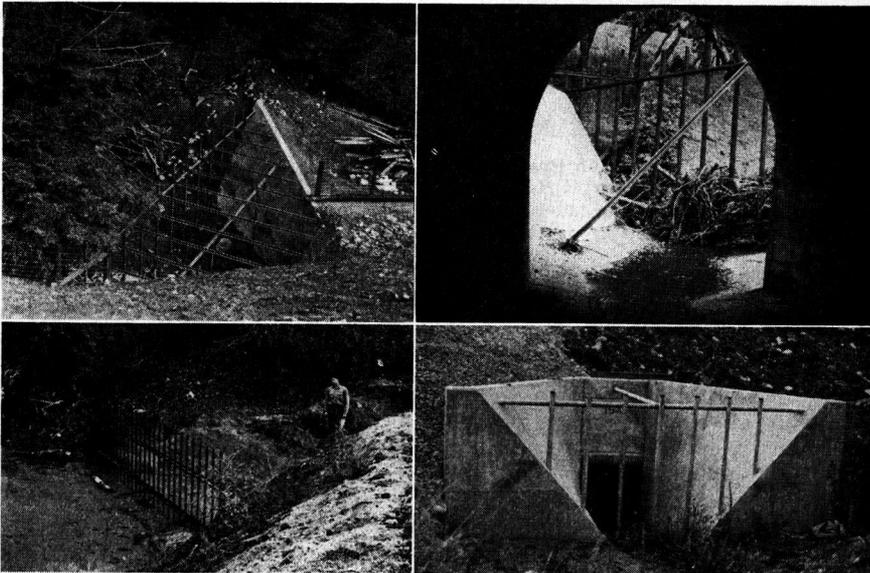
Upper left: Steel Debris Rack at End of Wingwalls to Large Reinforced Concrete Arch Culvert. Upper Right: Steel Rail Debris Rack at End of Wingwalls to Reinforced Concrete Arch Culvert. Lower Left: Steel Rail Debris Rack Placed in Channel Well Above a Culvert Entrance. Lower Right: Pipe Debris Rack at End of Wingwalls to Reinforced Concrete Culvert. Note warped wingwalls and curved-lip crown.
